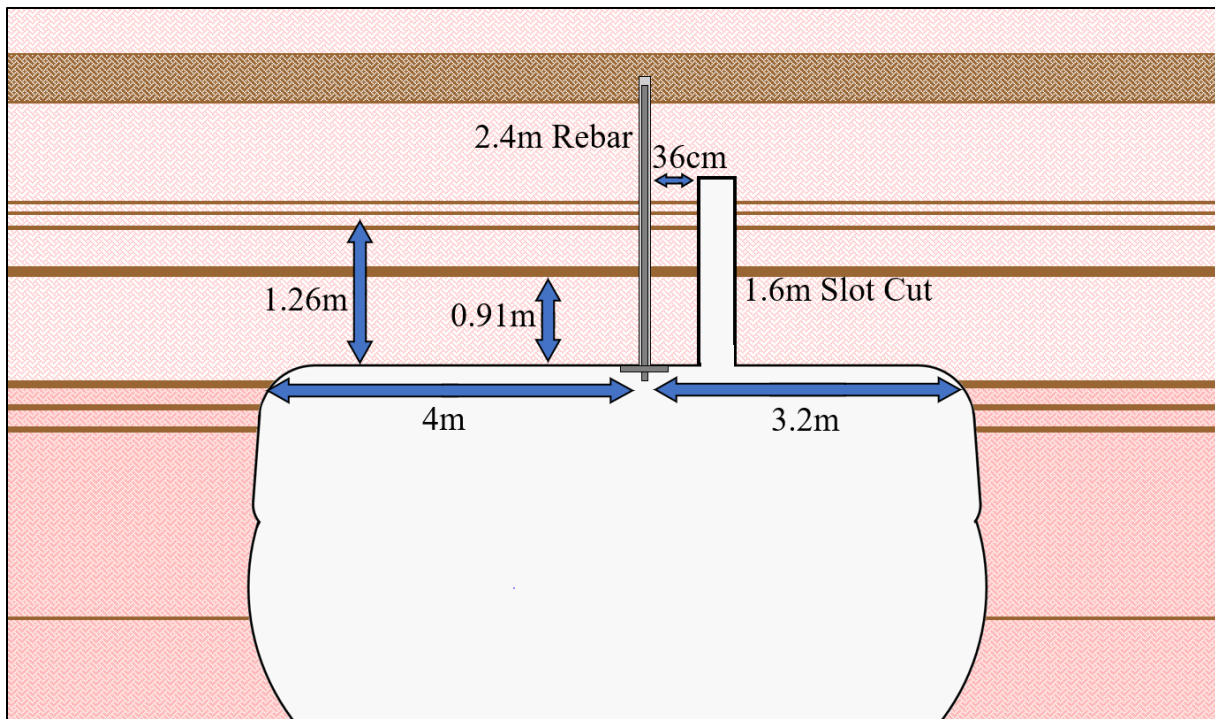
Cross-sectional view of the drift where instrumented rebar was installed at Mosaic Colonsay
